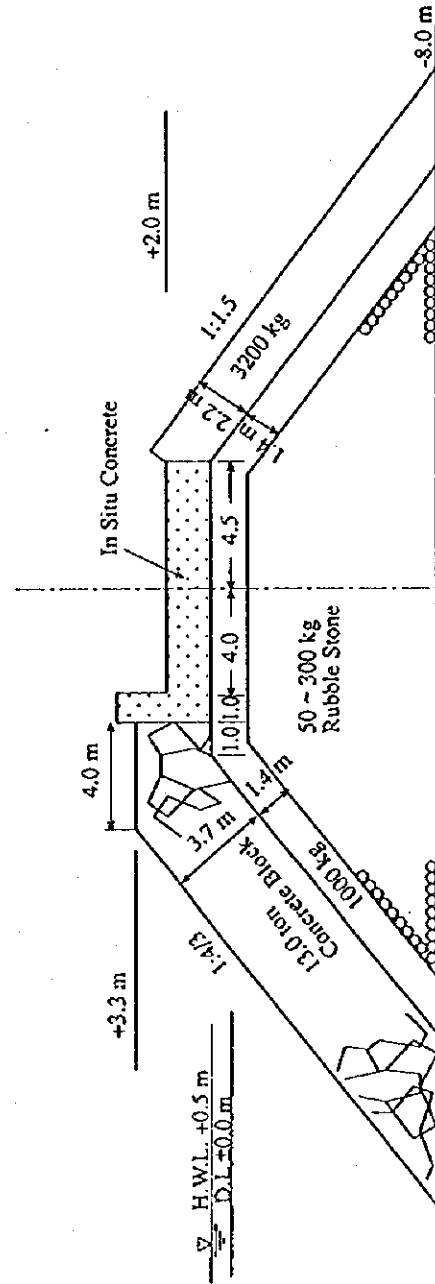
Standard Cross Section of Breakwater Rubble Mound Type (-8.0m)
